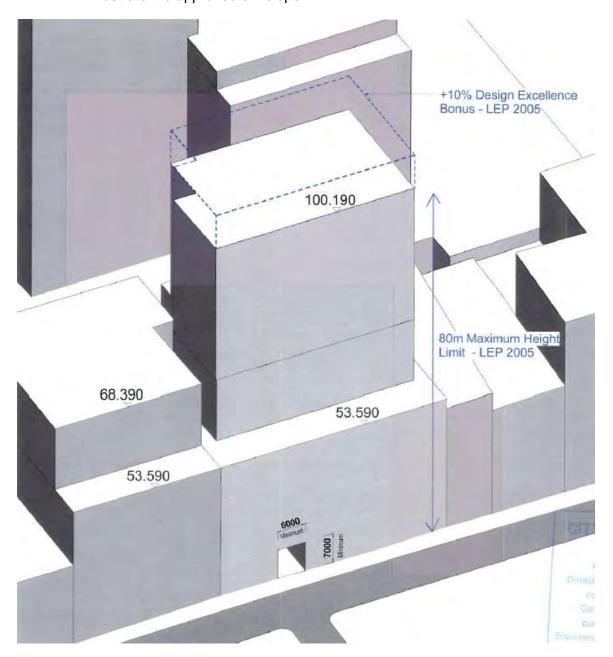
Approved Stage 1 building envelope as viewed from Clarence Street side.
